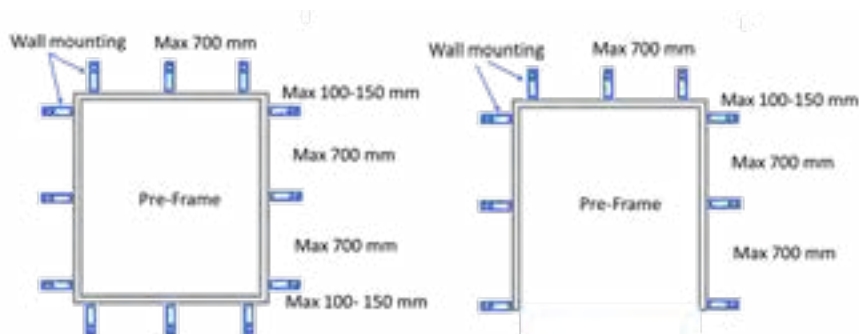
Windows fastening by using a pre-frame (Technical manual of Windows Installation, POVAS 2019)
